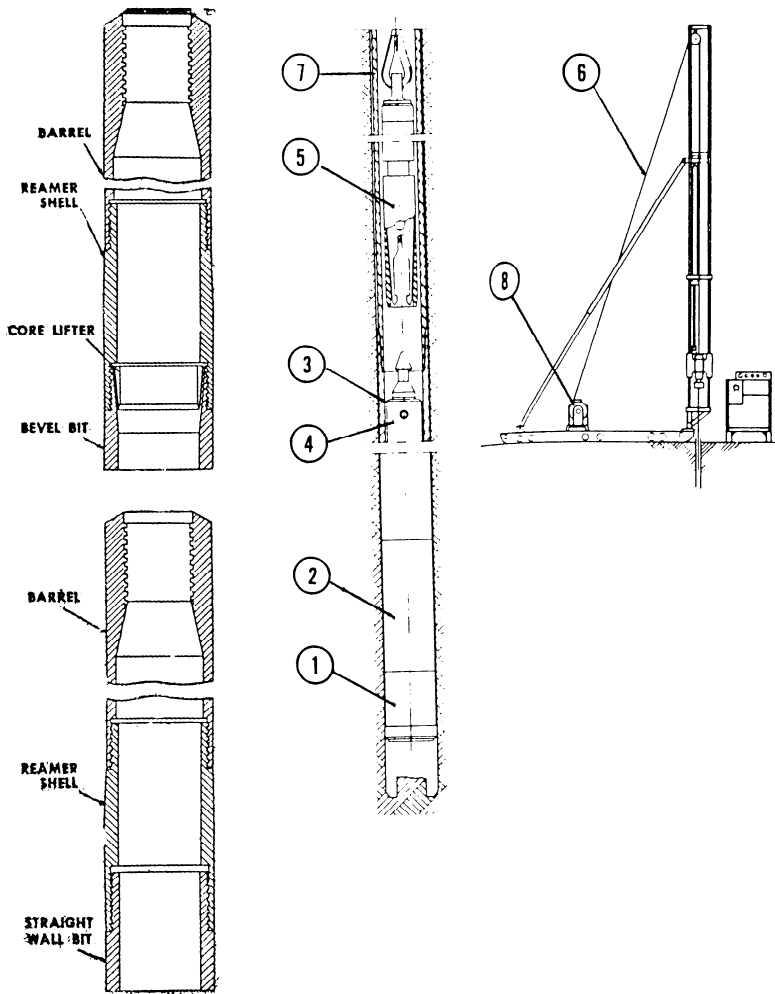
Conventional and wireline core barrel systems. Left: Single-tube core barrel with bevel wall bit and core spring or "core lifter" (top) and straight wall bit (bottom). Right: Wireline drilling equipment that consists of (1) diamond drillbit, (2) diamond set reaming shell, (3) outer core barrel complete, (4) inner tube assembly, (5) overshot assembly, (6) wireline cable, (7) drill rod string, and (8) wireline hoist. (Reproduced by permission from *Diamond Drill Handbook*, 1980, pp. 55, 63.)
